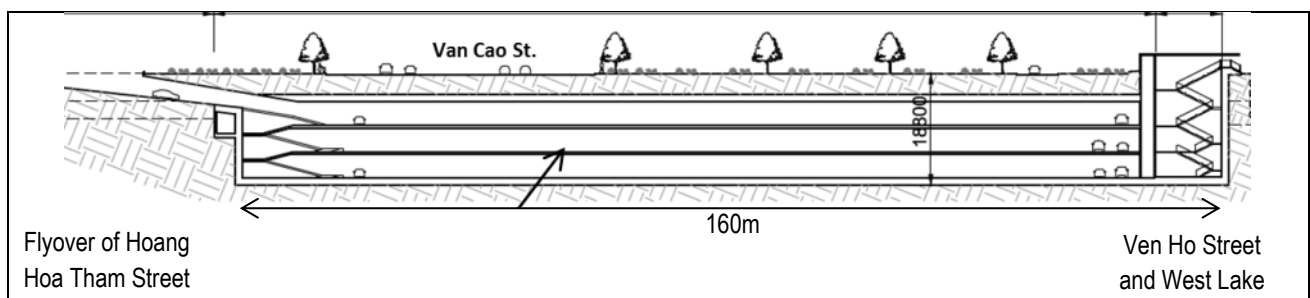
Cross Section of Underground Parking along Van Cao Street
